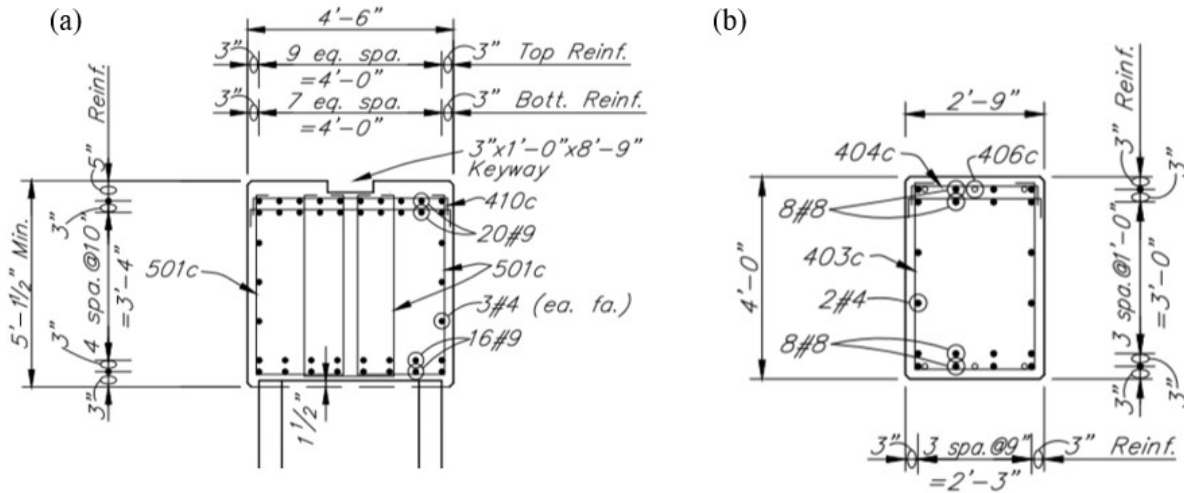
Typical Cross-Section of the Beam Type 1 (a) and Beam Type 2 (b) (NBI 18790) (2014)
